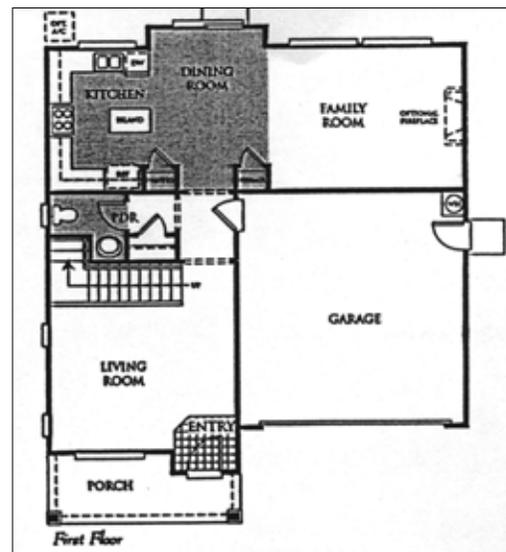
Typical first-floor plan for wood-frame house in California, USA (WHE Report 90)
